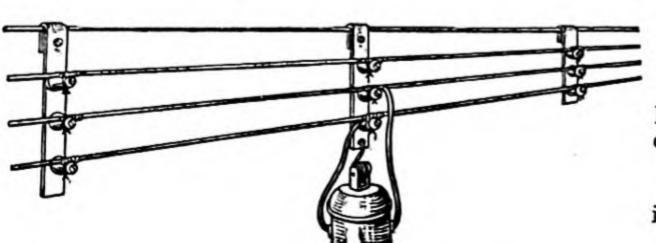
Messenger installation cable made with wires supported on knob fixed insulators strip steel hangers.
